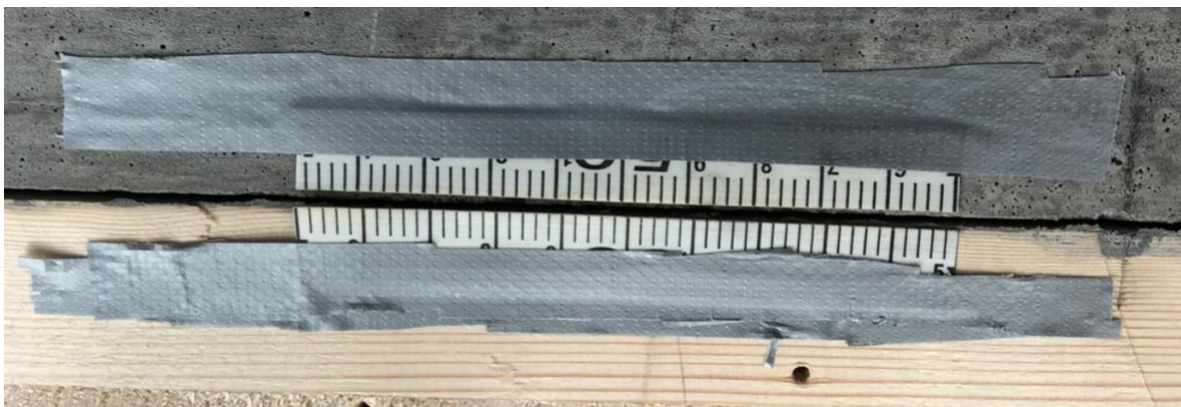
Movement in concrete and timber for Slab A4 at edge
